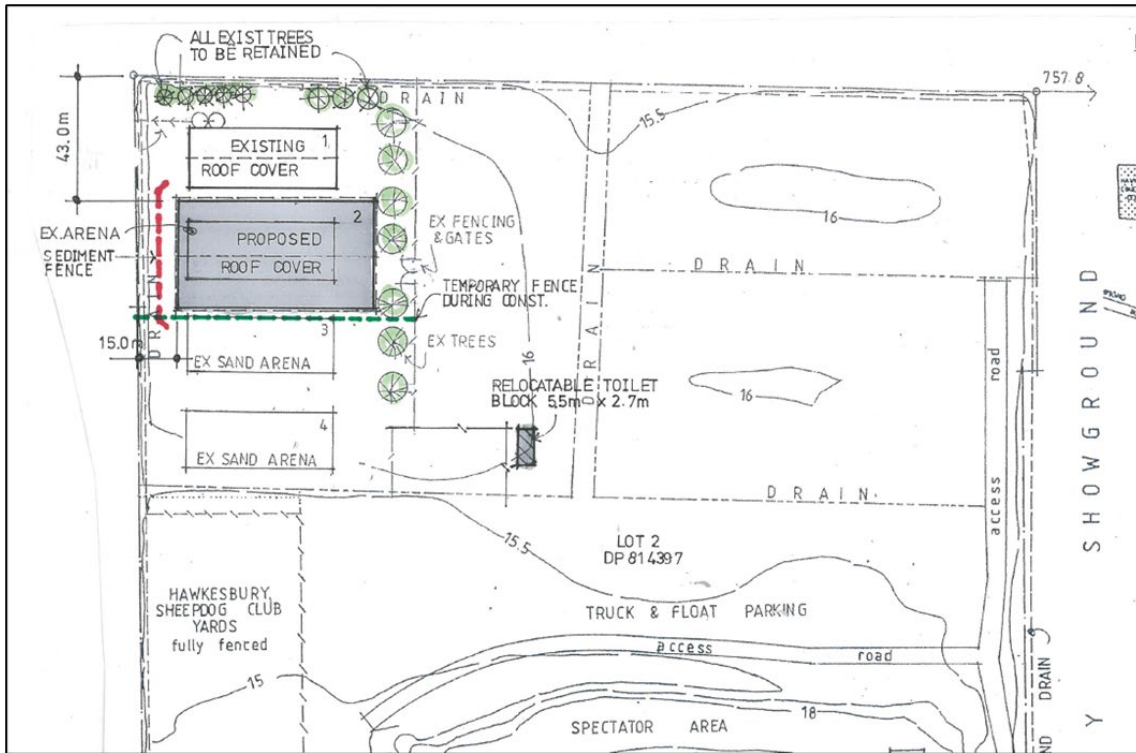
Location of proposed roof and relocatable amenities building in north-eastern corner of site
